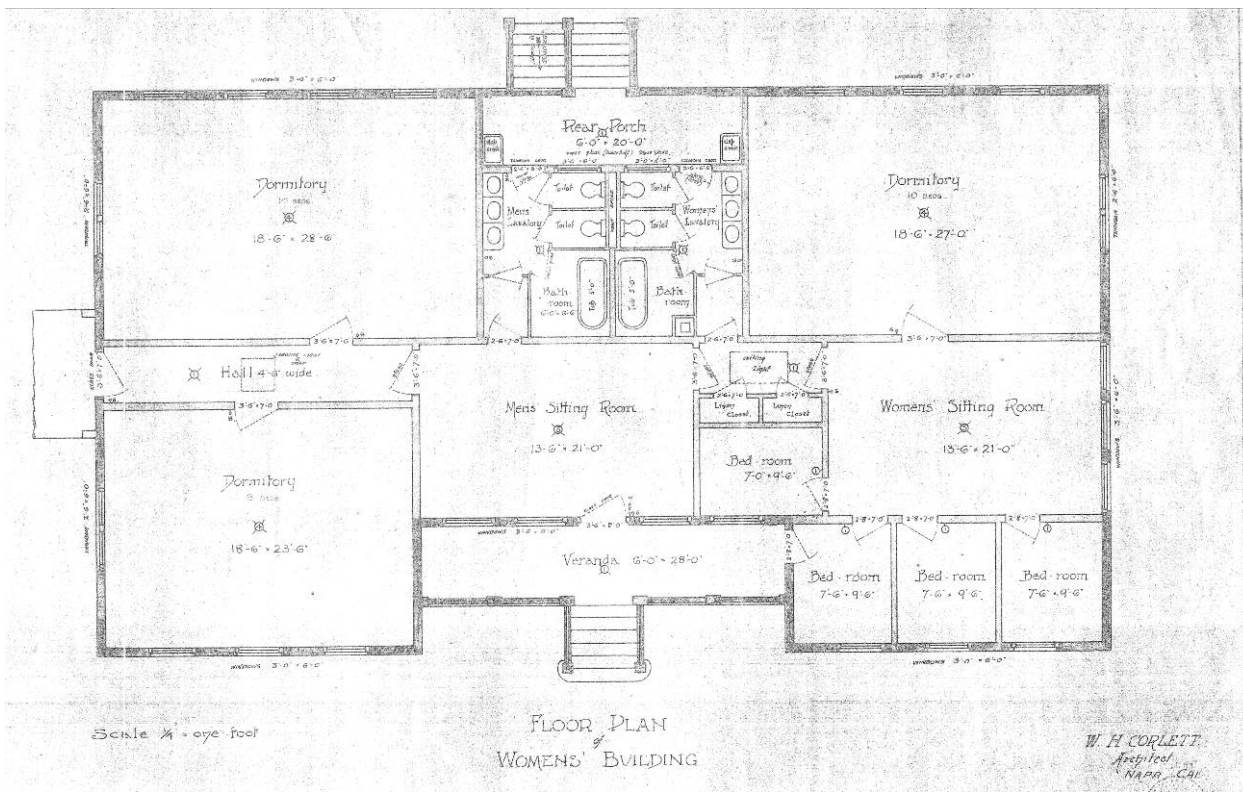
W.H. Corlett, Floor Plan of Women's Building, undated c1912.
